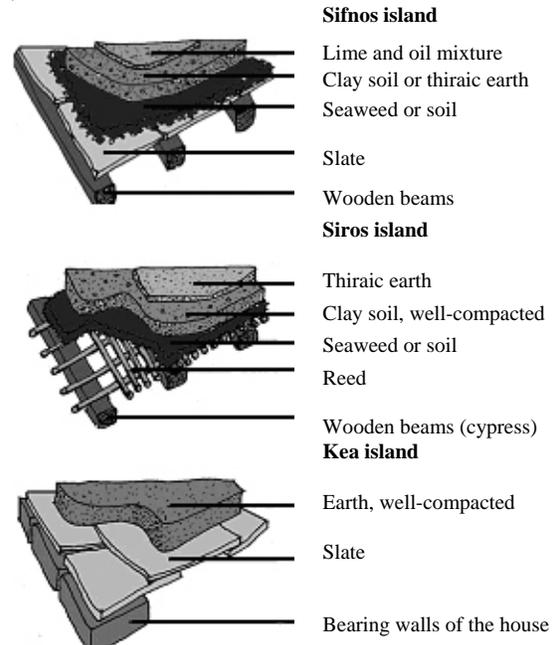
Sections of typical flat roof construction in islands of the Cyclades complex.
